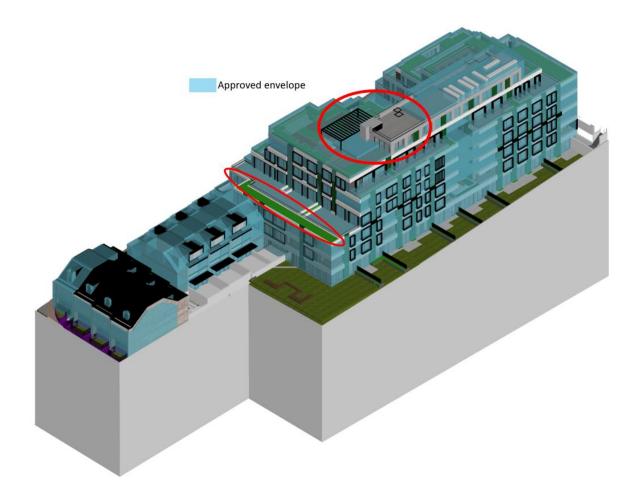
3D model depicting detailed design proposal D/2021/711 with an overlay of the approved concept envelope in blue. The additional area outside of the envelope at level 5 is circled in red.
